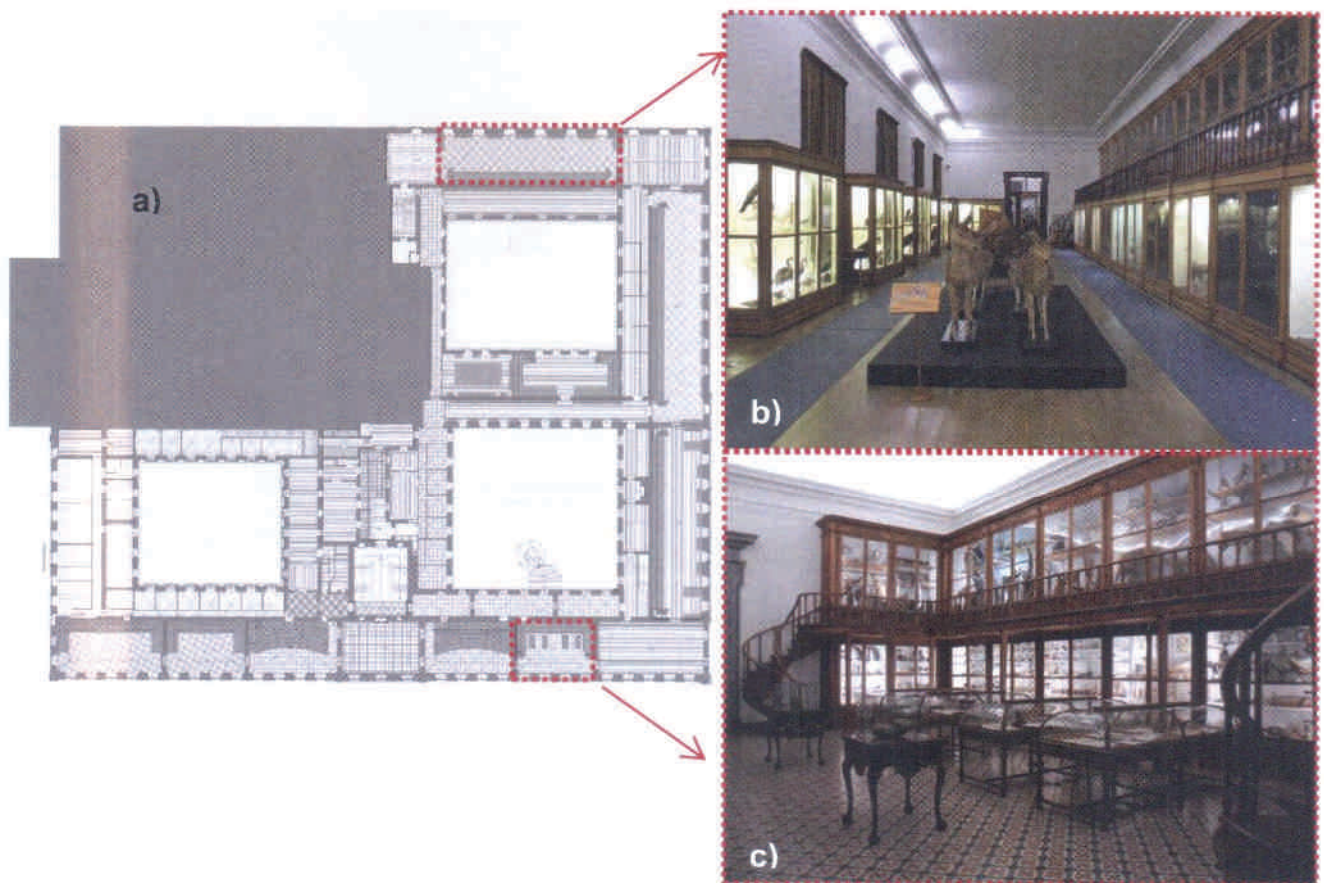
a) Plan of the first floor of MCUC; b) Portugal Hall; c) Vandelli Hall
